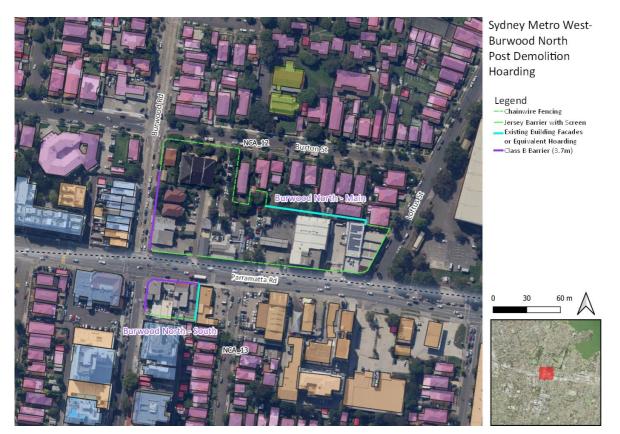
Hoarding layout – Post demolition, pre acoustic shed
